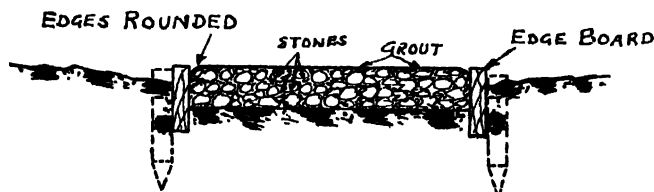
“CHEECOL” GROUTED PATH CONSTRUCTION
